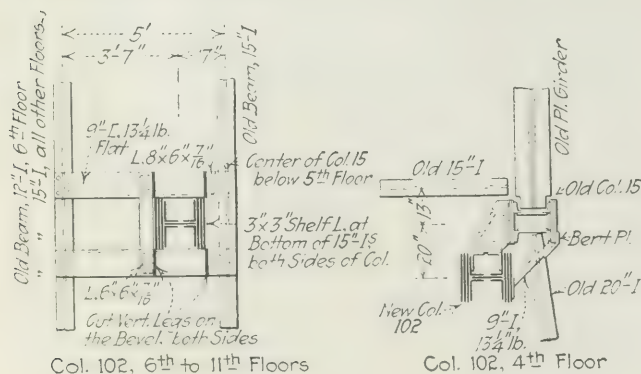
TWO TYPICAL STAY-CONNECTIONS OF NEW COLUMNS
